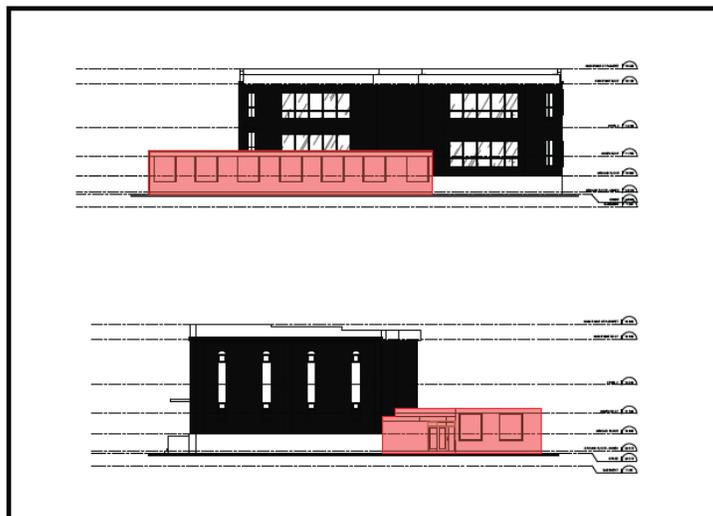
Northwest and southeast elevations of proposed demolition. EVOQ.
